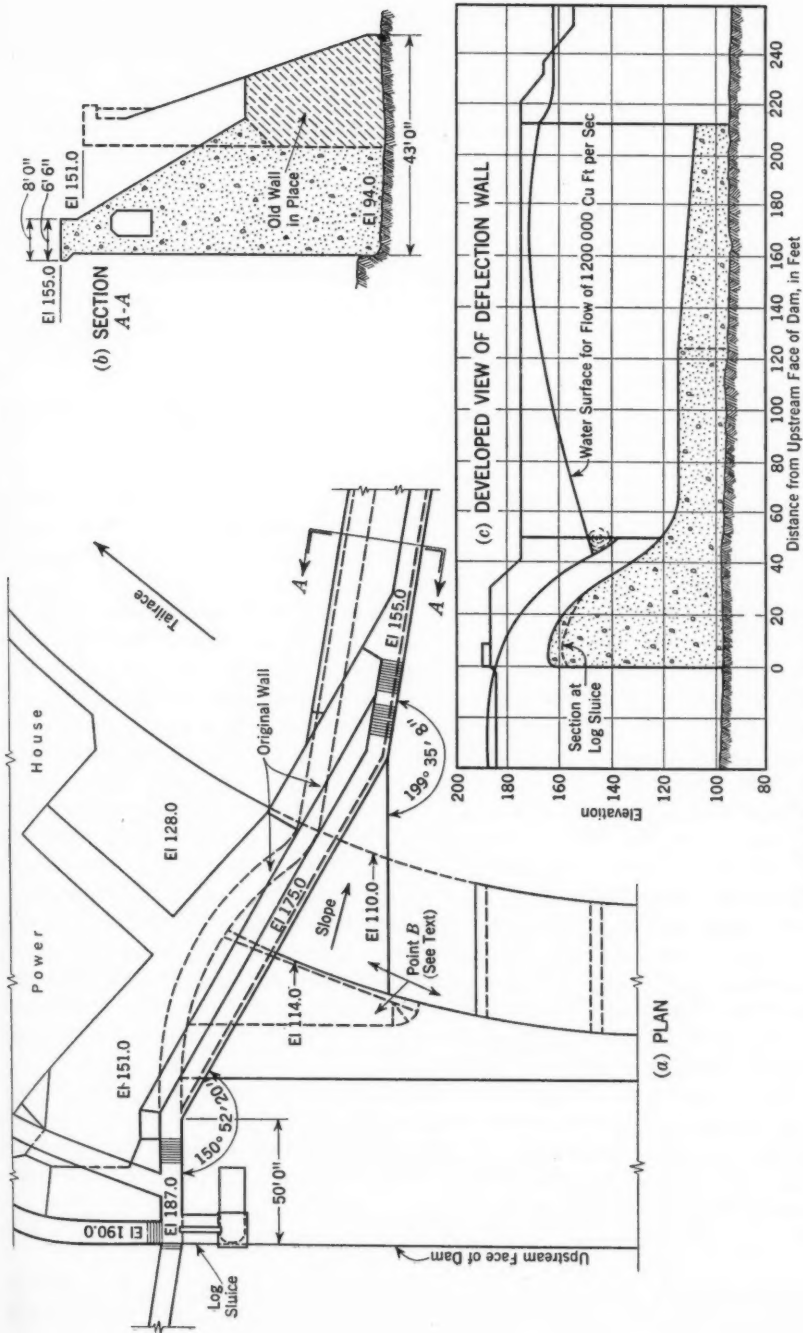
TAILRACE DEFLECTION WALL, HOLTWOOD DAM
